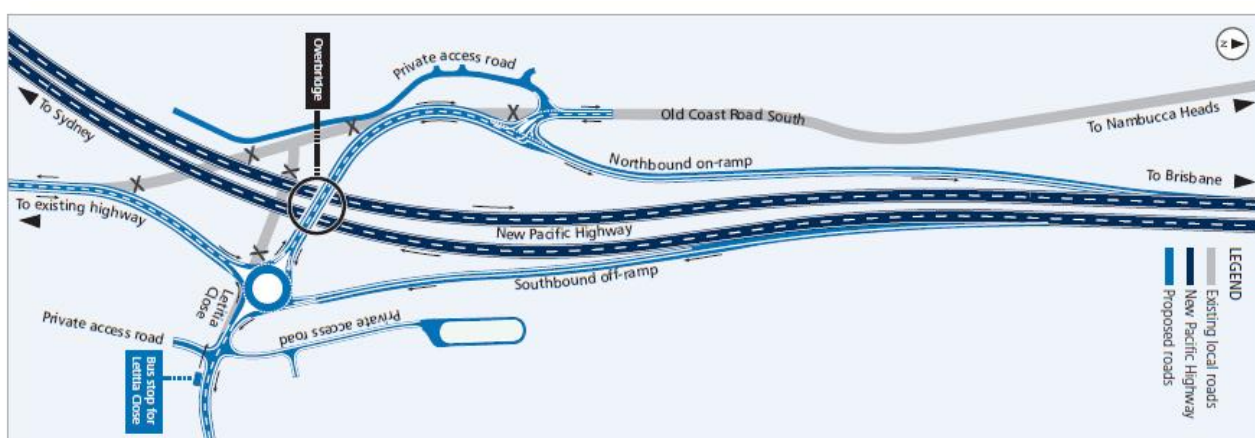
Macksville North Facing Ramps and highway upgrade
